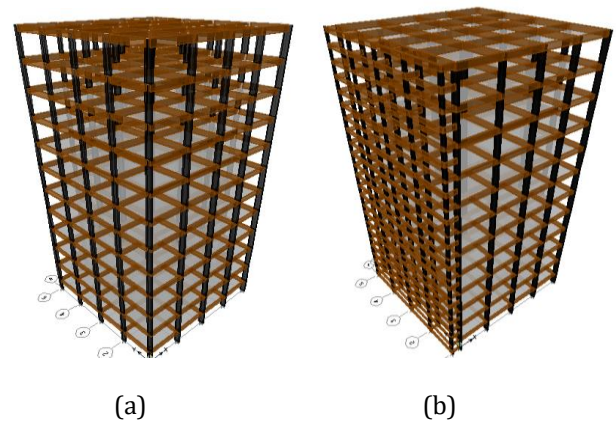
3D view of 11 storeyed building. (a) normal frame. (b) linked column frame.
